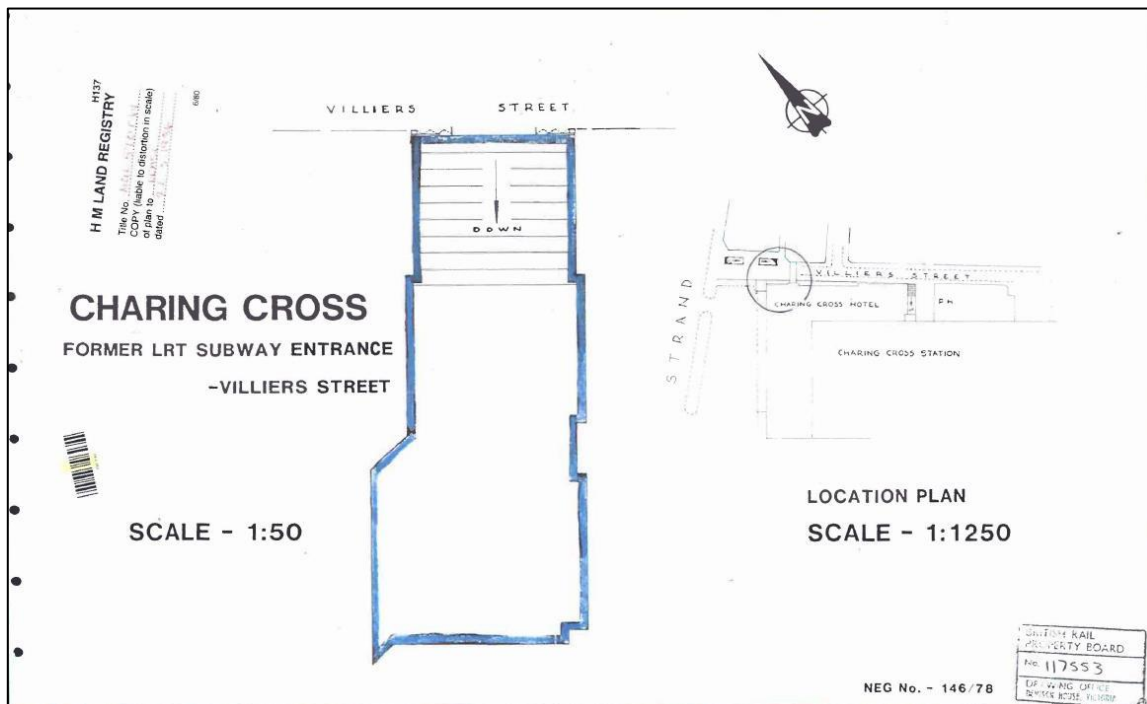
Hotel Lease Extract Plan for 2 Villiers Street concession
